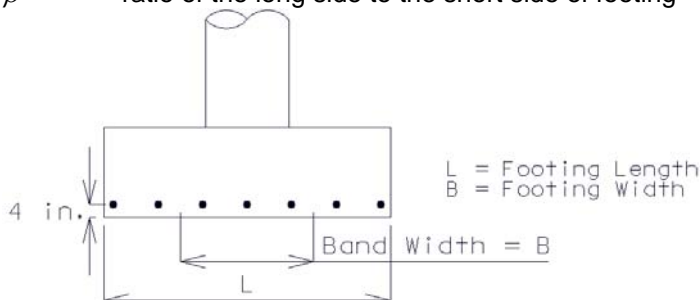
Distribution of Reinforcement in Spread Footing
